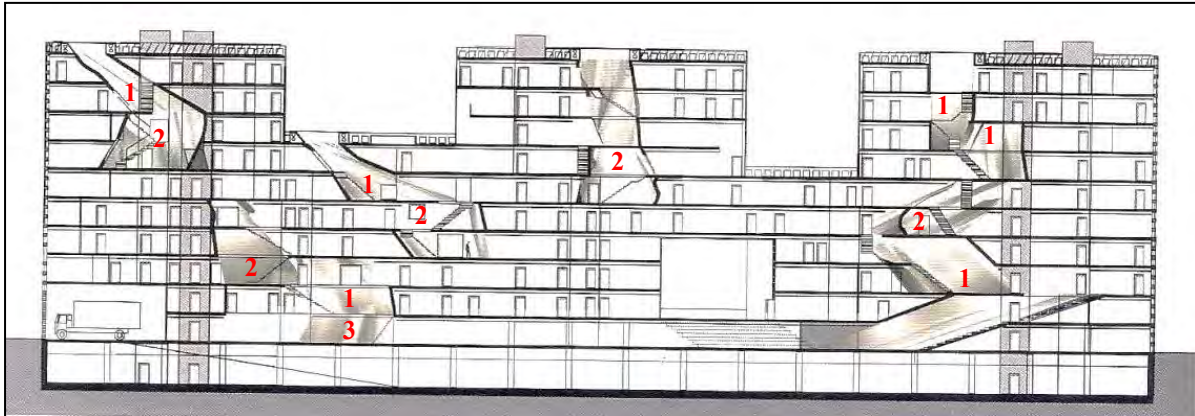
(Source: Frampton, 2003) : Longitudinal section (NTS).
